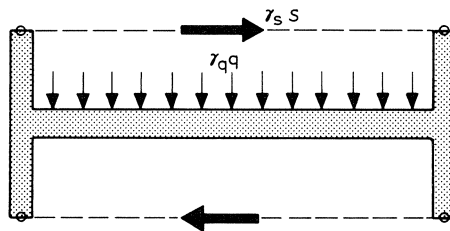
Unbraced single-bay frame under vertical and horizontal loading.
